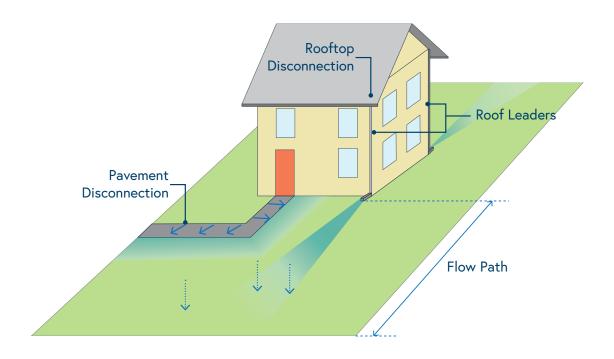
Illustration of Flowpath for Rooftop and Pavement Disconnection
